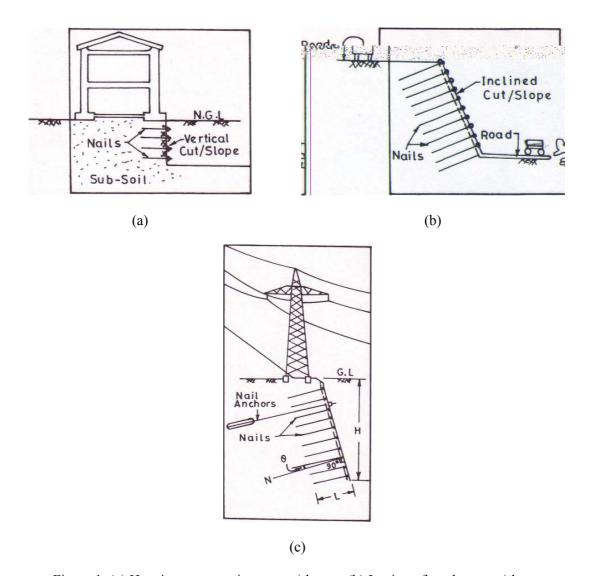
(a) Housing construction on cut/slopes (b) Laying of roads on cut/slopes (c) Transmission tower foundations
